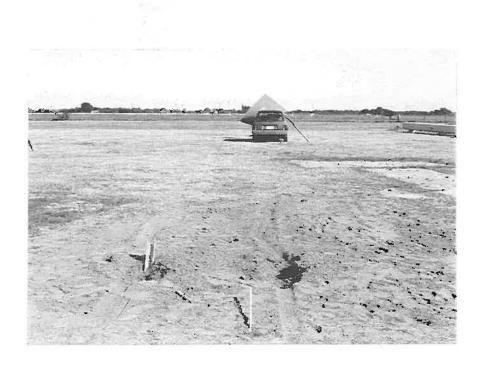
Final rest position of the sign installation and vehicle (test 405231-20).
